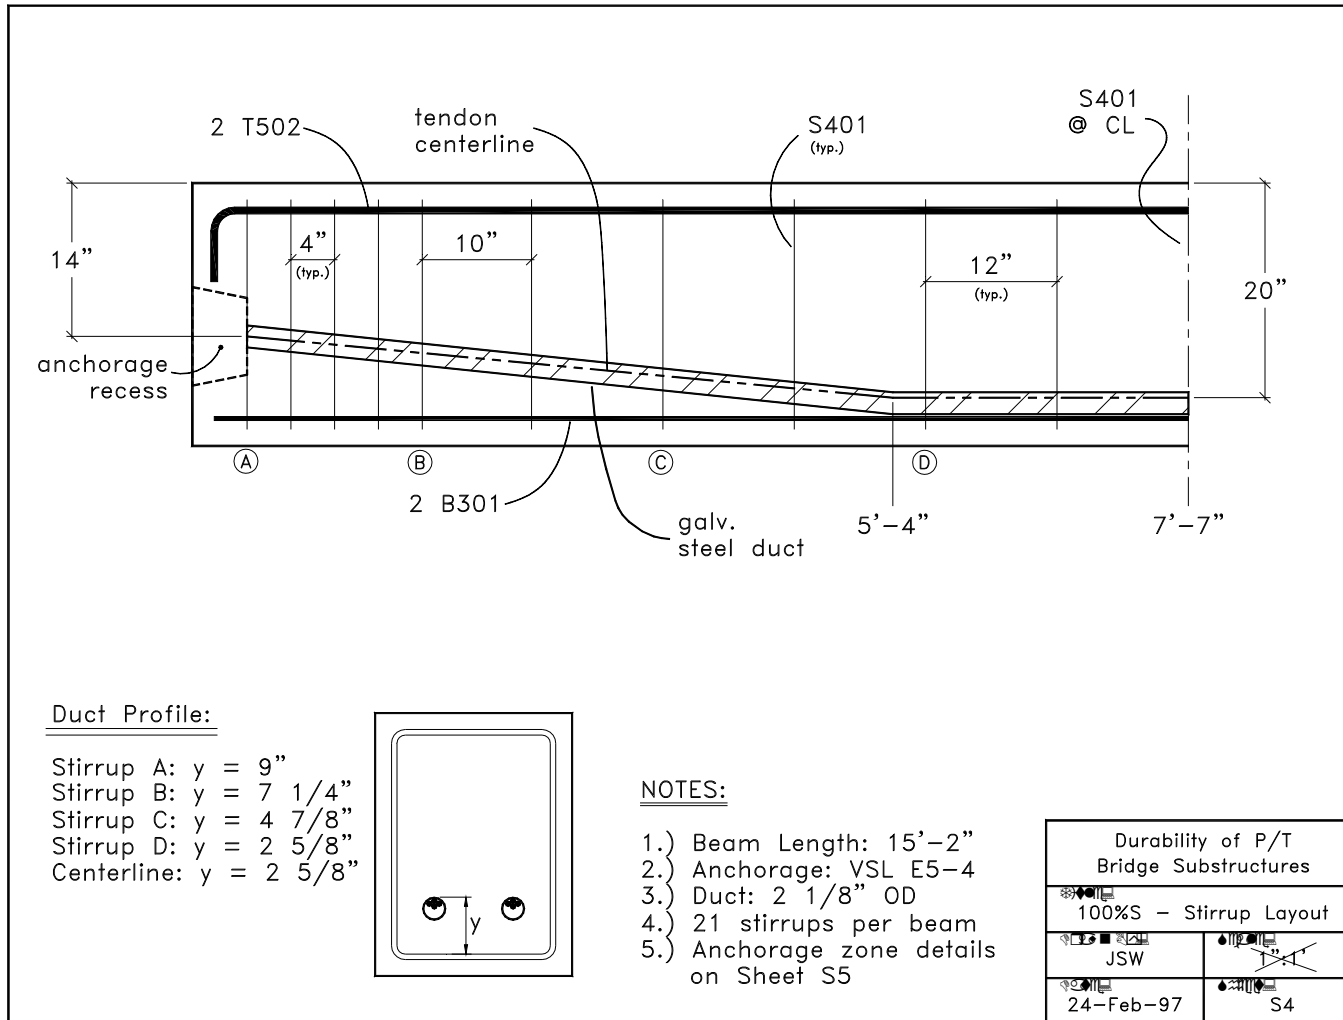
Sheet S4: 100%S Stirrup Layout
